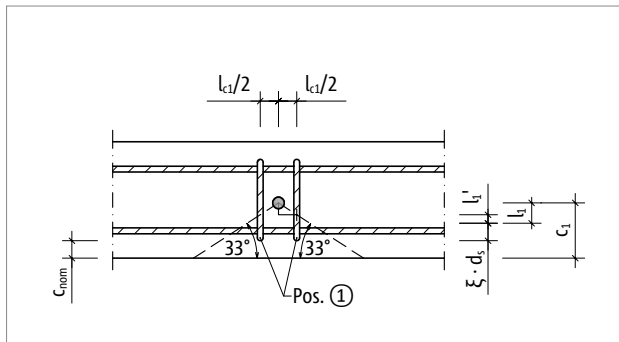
Schöck Stacon® type LD: Dimensions of the breakout cone of the concrete edge
